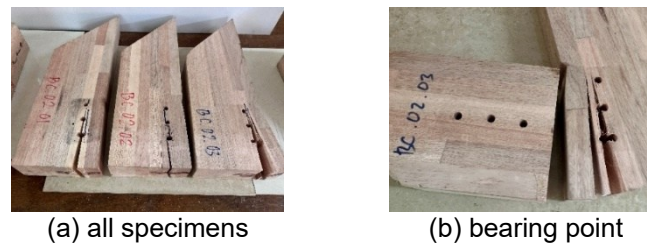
Failure pattern of three specimens of glulam beam-to-column connections Type 1
